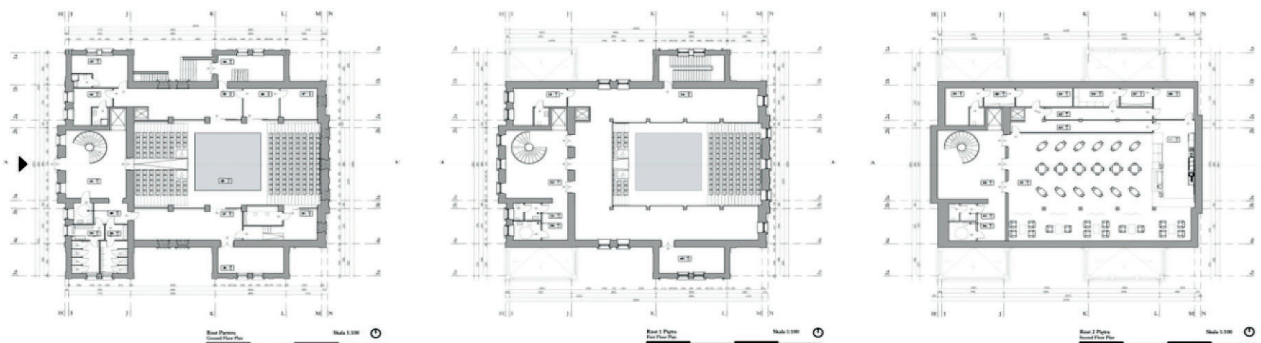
Synagogue in Kielce. Design. Floor plans of the building (ground floor, first floor, second floor) [21]
